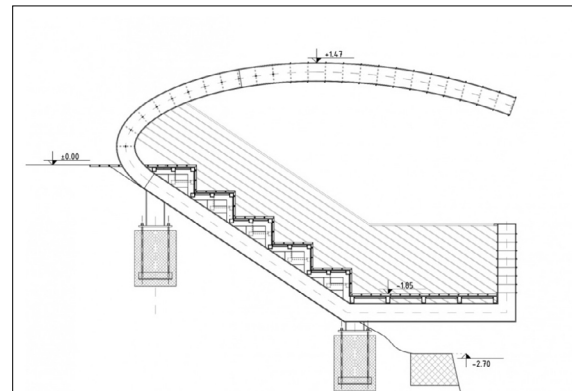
Illustration nr. 57 / Transversal Section of the new Pavillion built on the Petkovskovo Embankment
